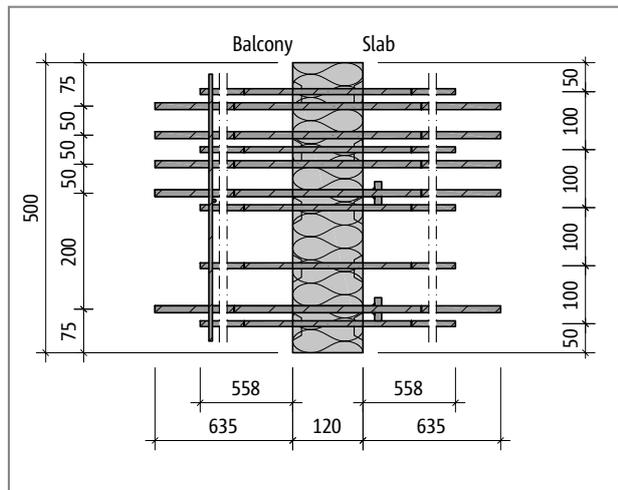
Schöck Isokorb® XT type C-L-M1-V1: Product plan view
